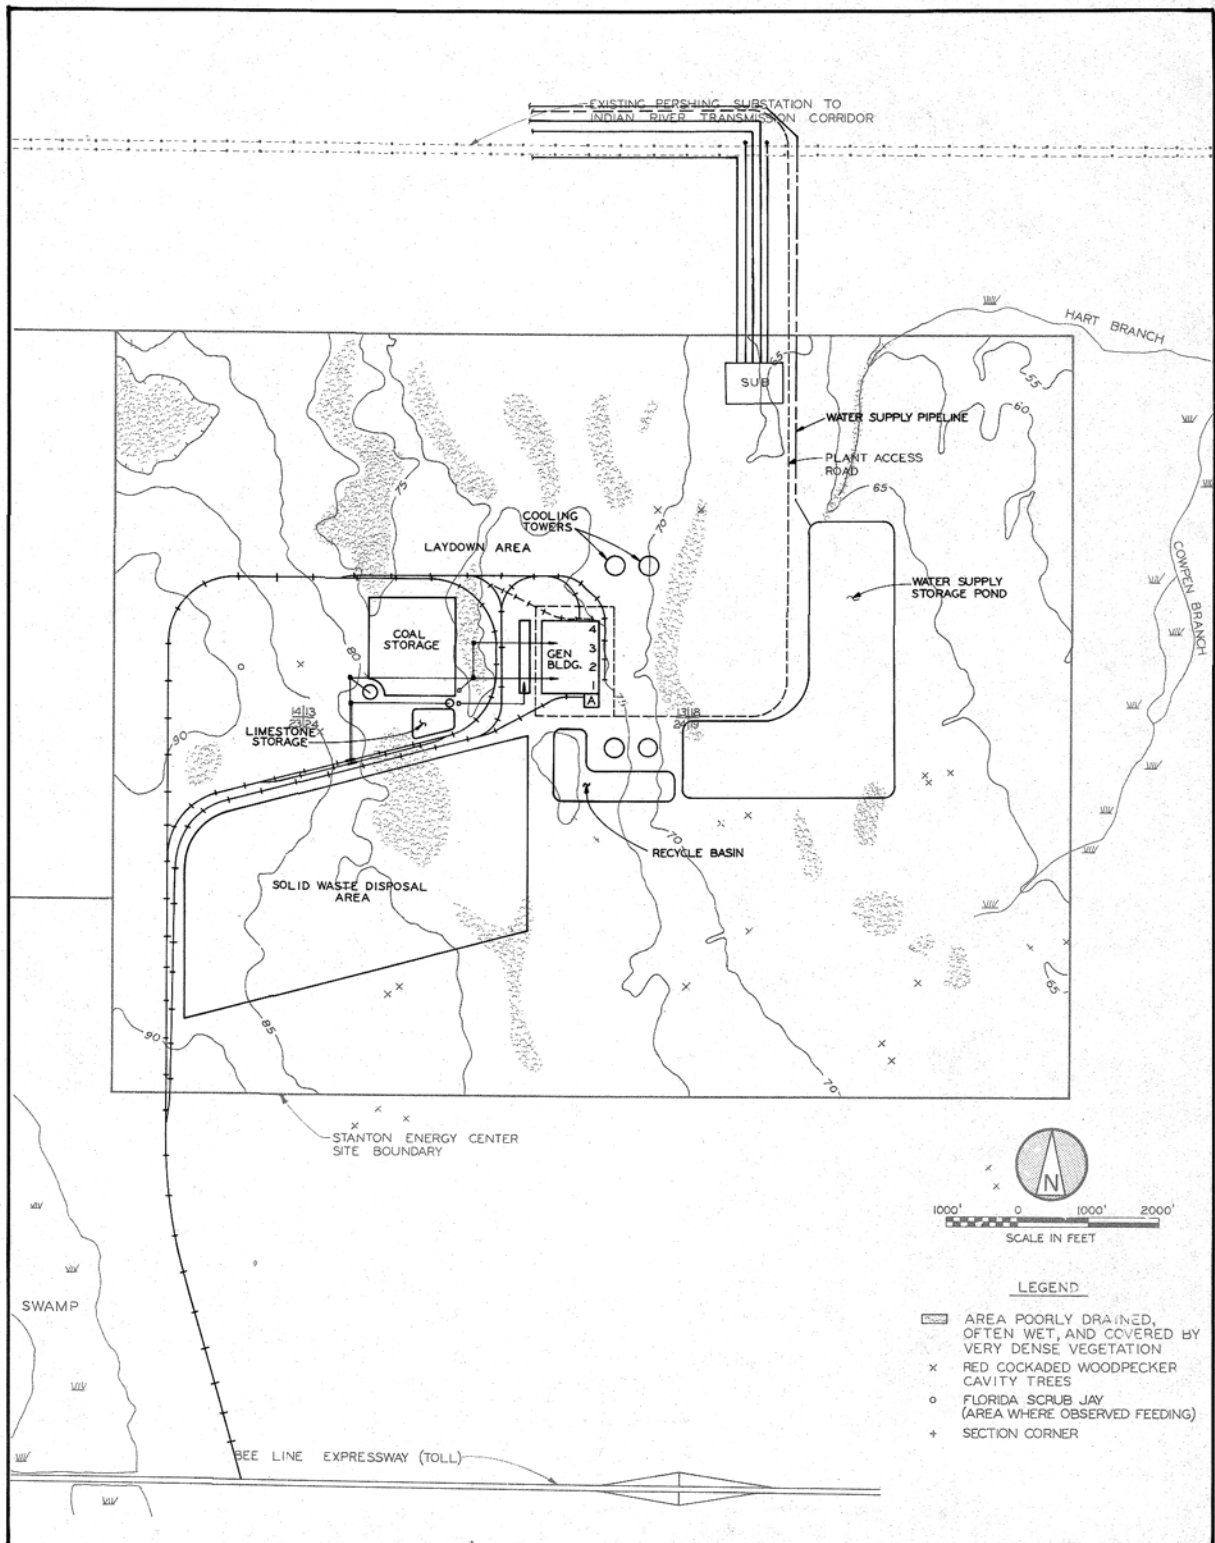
SITE ARRANGEMENT-PLAN C
